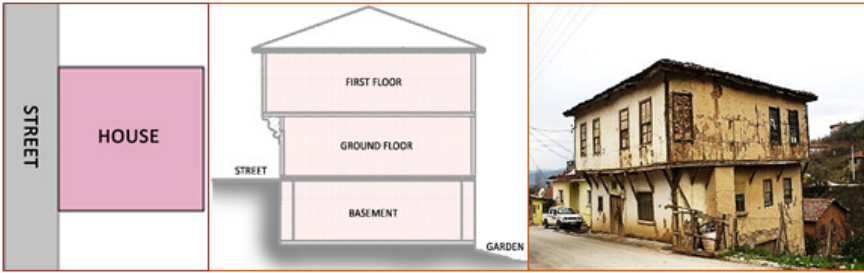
Direct entrance to the house from the street; plan, section and view
